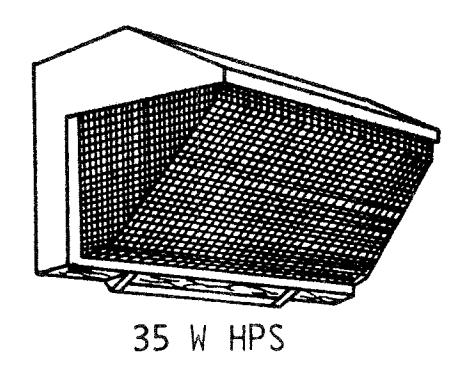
DETAIL - FIXTURE BA - HID WALL-MOUNTED LUMINAIRE
